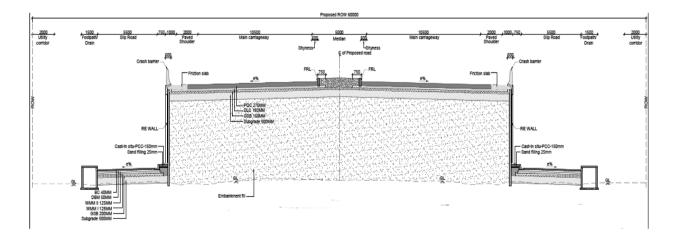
(TCS-6C) Four Lane Underpass Cross Section with Slip Roads in Bypass & Realignment
